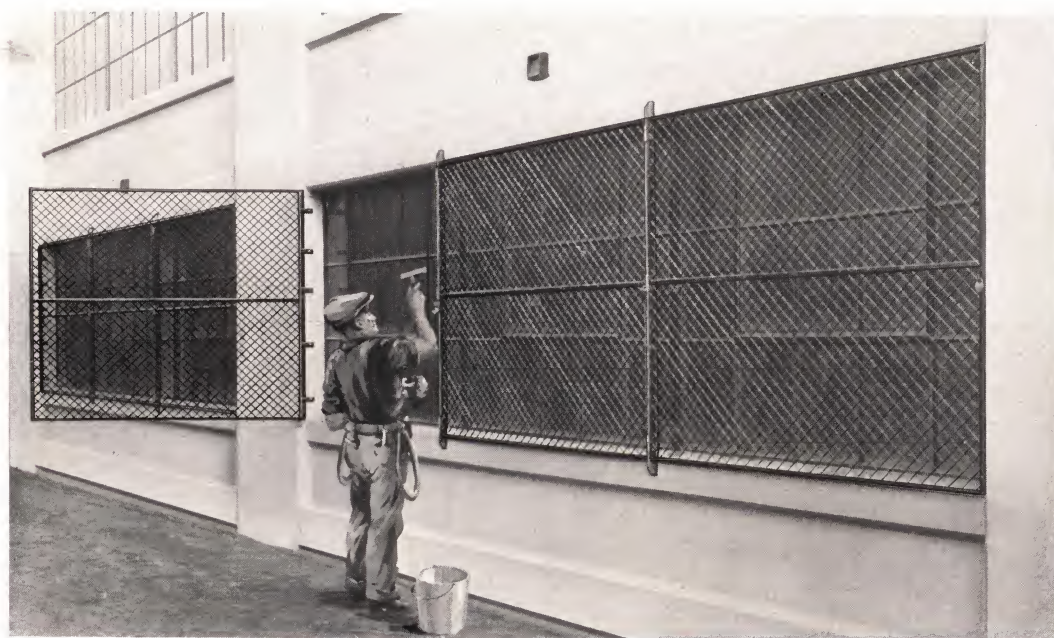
Horrocks Wire Window Guards, hinged and locking, on a concrete building. Hinges permit the opening of guards to clean the windows as illustrated.
